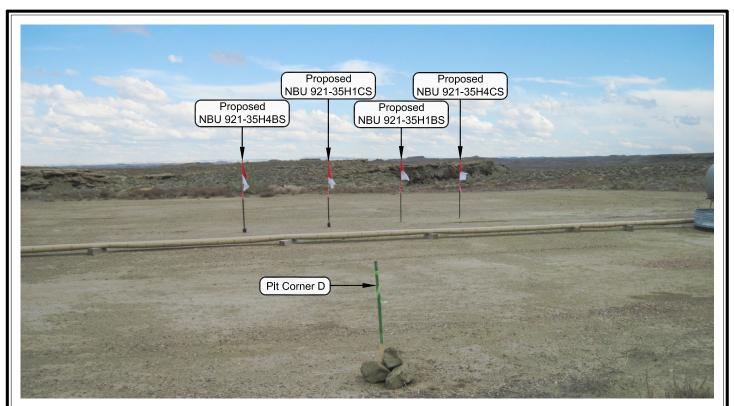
PHOTO VIEW: FROM PIT CORNER D TO LOCATION STAKE
